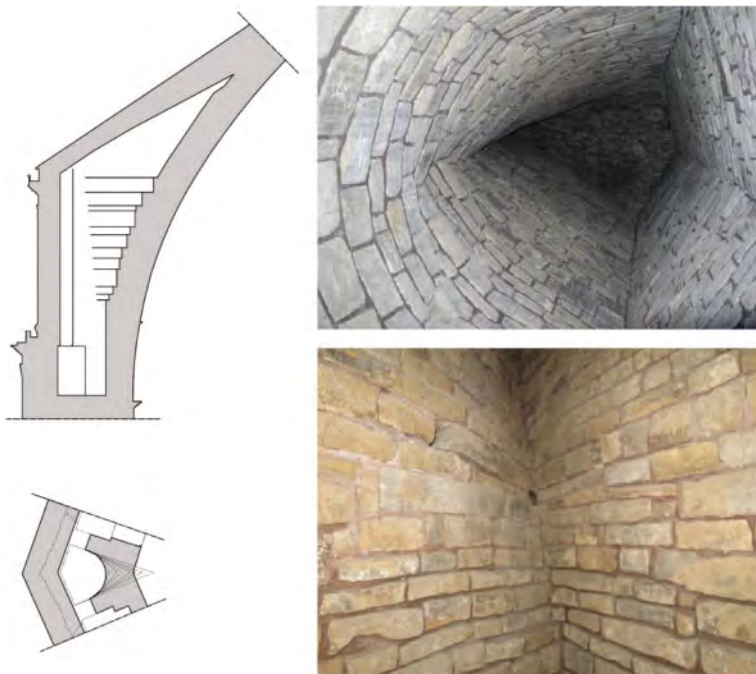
Detail of a corner space at garret level; plan and section with images showing the changes in shape and the continuity of the masonry rows.
